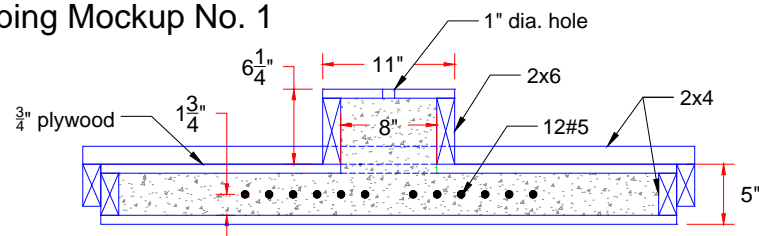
Dimensions and reinforcement of the field test No. 1 specimen
